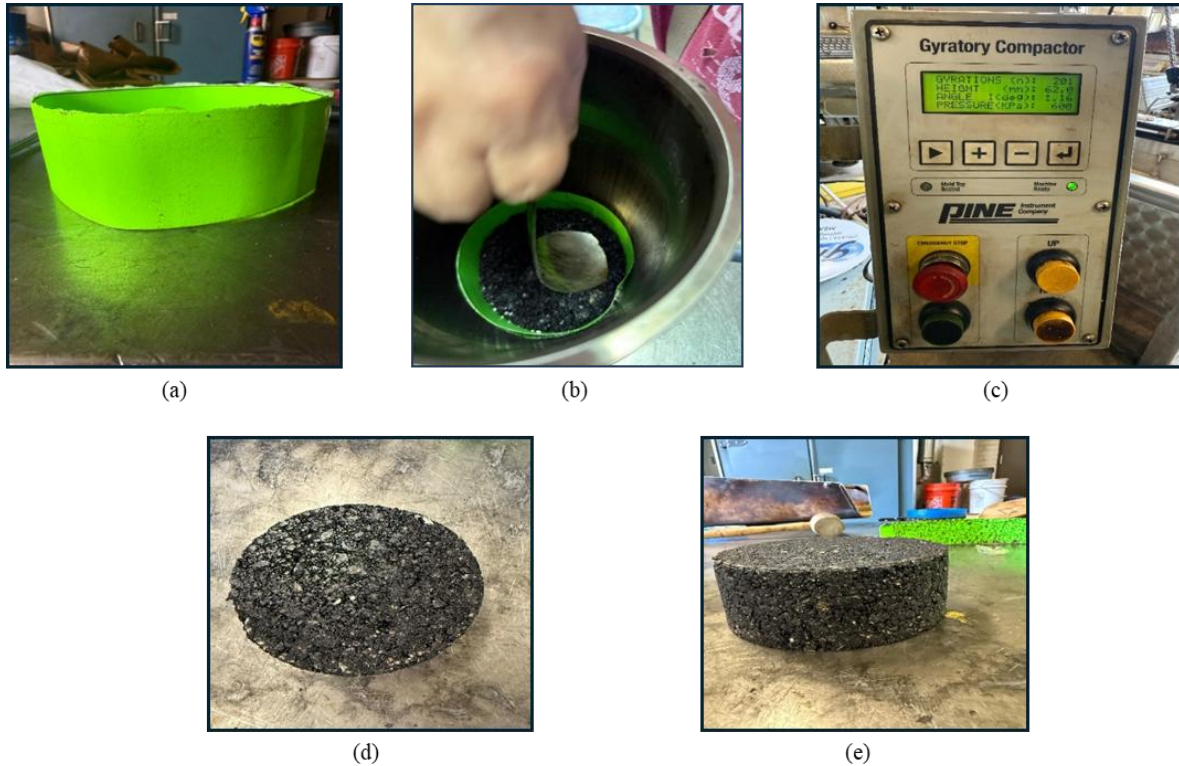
Preparation of the Bottom Layer Specimen for Composite Asphalt Sample Fabrication, (a) Paperboard Strip Used to Reduce the Internal Diameter of the SGC Mold, (b) Placement of Paperboard Liner Inside the Mold and Tamping to Compact a Slightly Smaller Bottom Layer Specimen, (c) Gyratory Compactor Settings Used During Compaction: 201 Gyration, 62.0 mm Height, 1.16° Angle, and 600 kPa Pressure, (d) Top-View of the Compacted Bottom Layer, (e) Compacted Bottom Layer Specimen after Removal from the Mold
